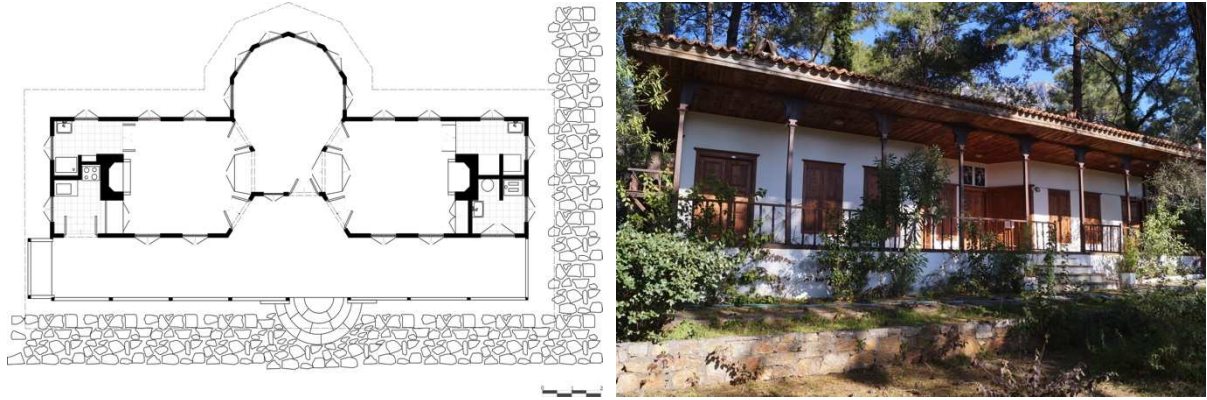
The Nail Çakırhan House Plan (Author). Nail Çakırhan House (Author).
